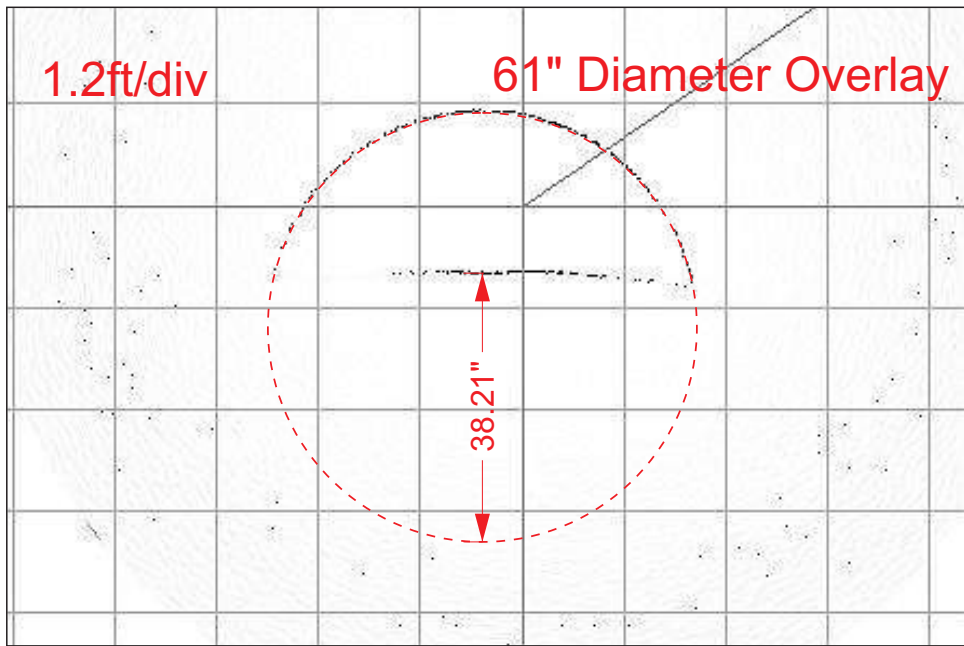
A-18: Sonar Profile 18 - In plant bypass, 16 feet upstream of Manhole 1.
